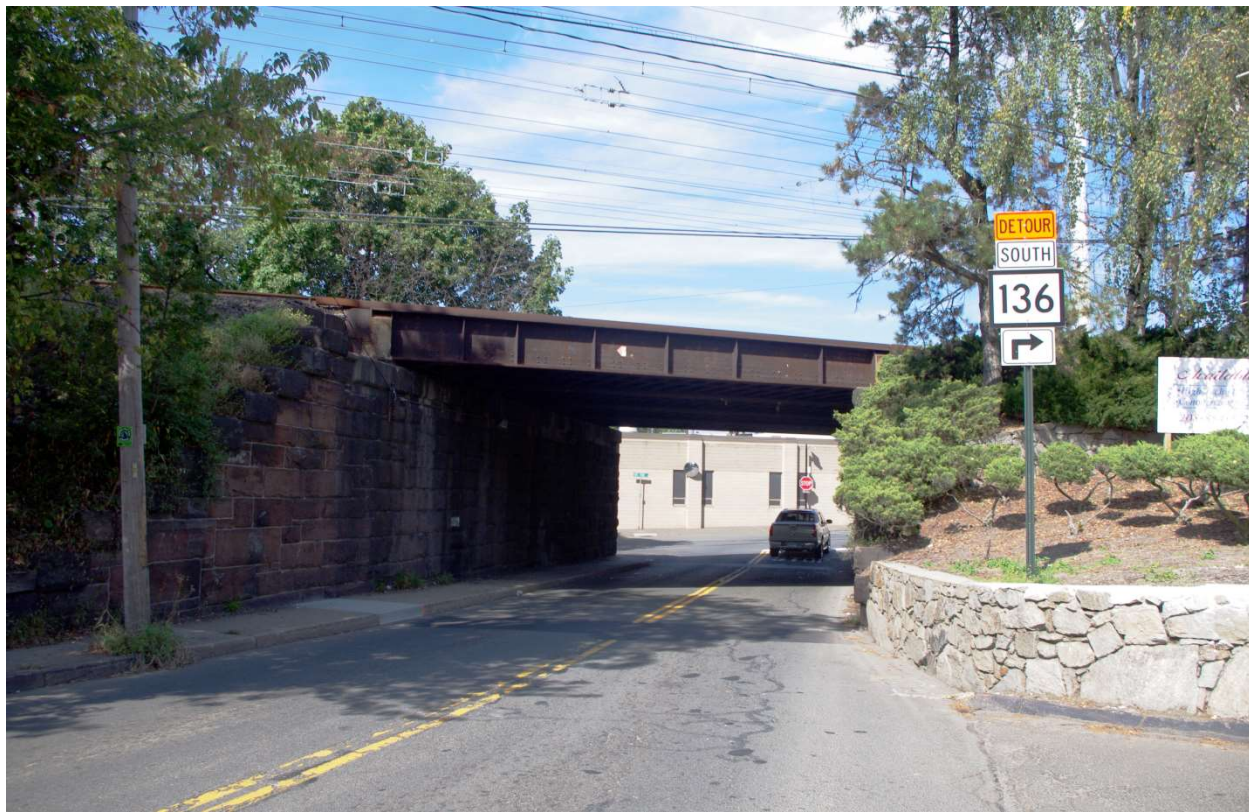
Retaining wall east of Fort Point Street Railroad Bridge, camera facing southwest.
